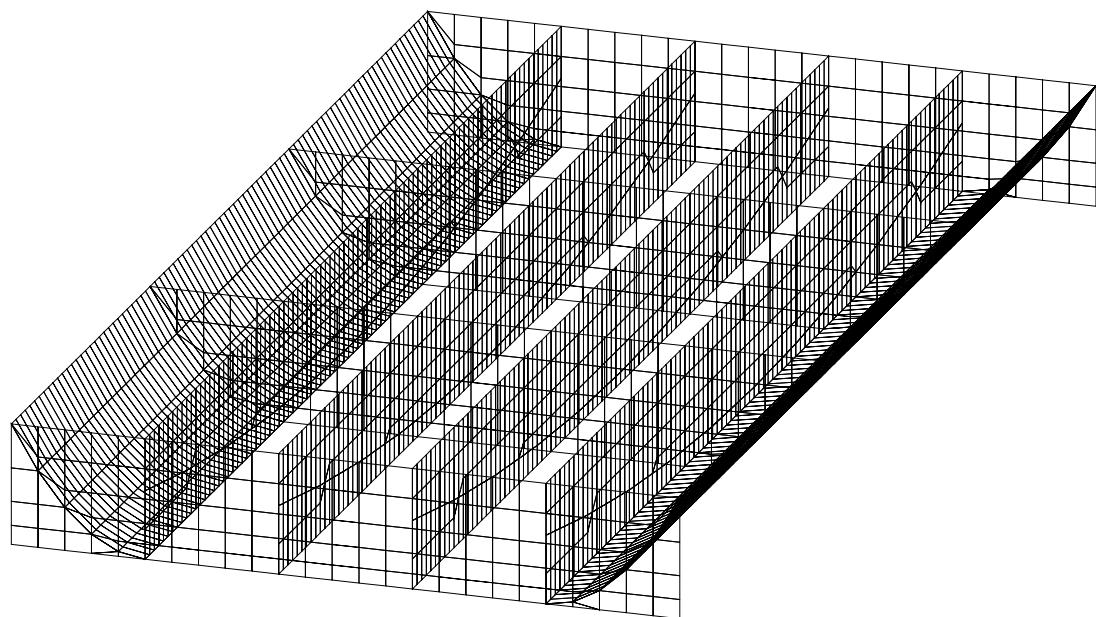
Bridge I1301E Shown Without Bottom Sofit and Top Deck
